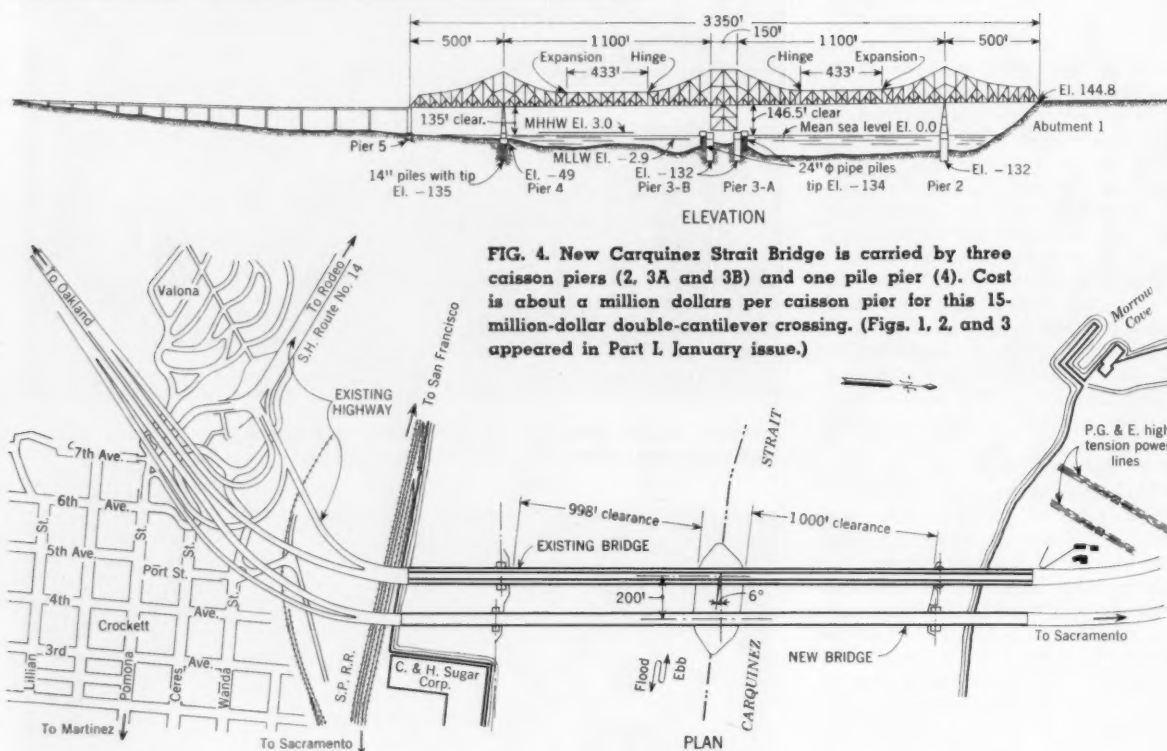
New Carquinez Strait Bridge is carried by three caisson piers (2, 3A and 3B) and one pile pier (4). Cost is about a million dollars per caisson pier for this 15-million-dollar double-cantilever crossing. (Figs. 1, 2, and 3 appeared in Part I, January issue.)
